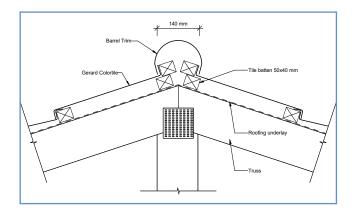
Barrel 150 trim on truss ridge
